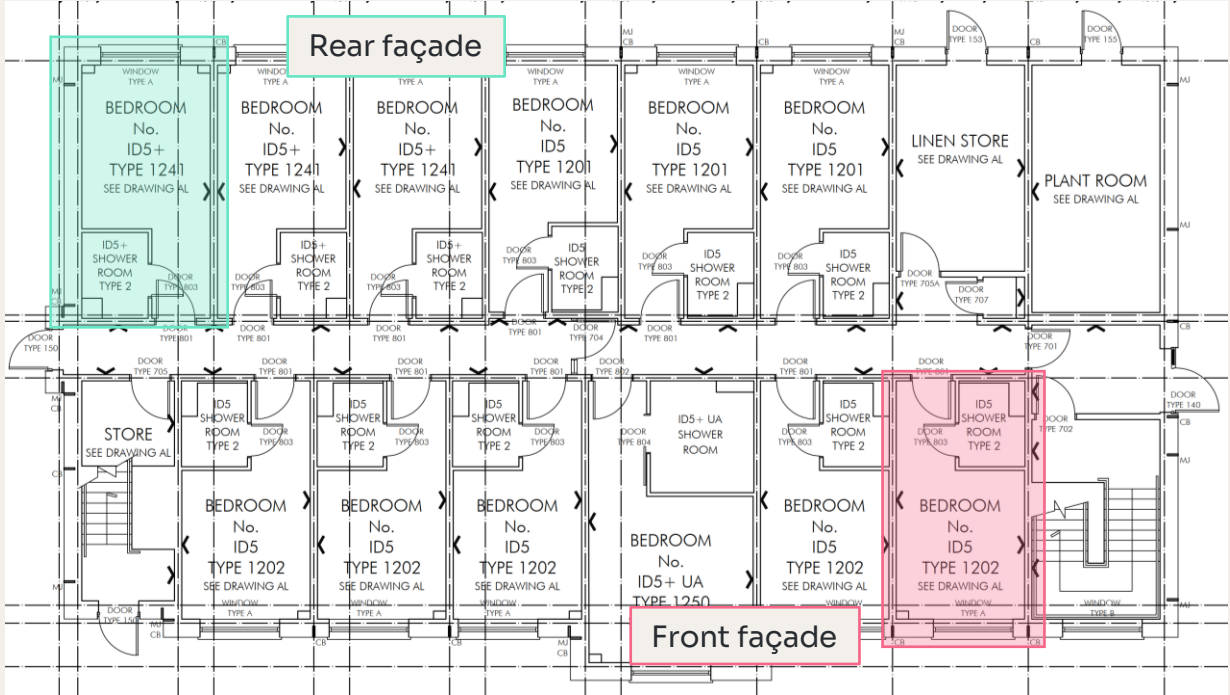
Ground floor layout with worst-case rooms highlighted in red
